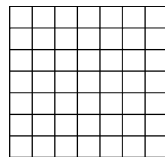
Type B – 10-storey RC square building (21 m × 21 m).
